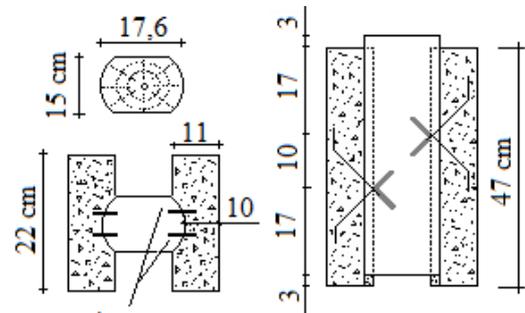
Wood-concrete specimen steel bar connectors glued in the form "X" [6] (units in cm)
